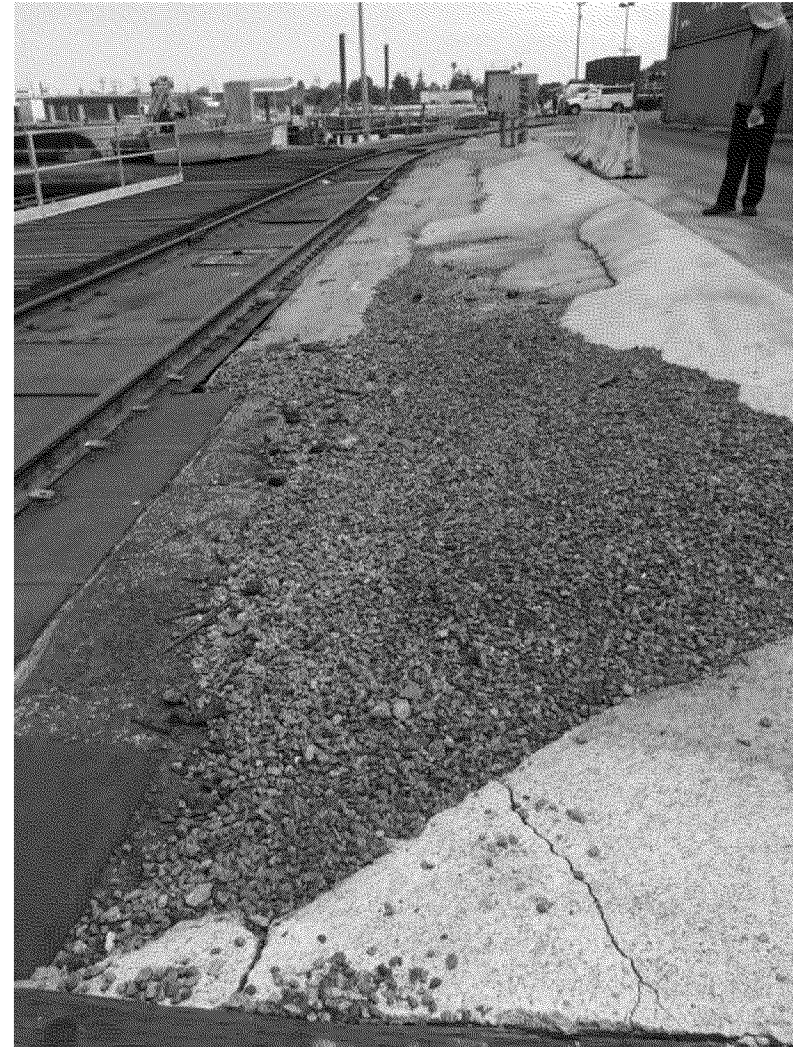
Looking north, surficial cracks and areas with sparse gravel coverage; area will be modified to have combination of gravel and concrete cap.
